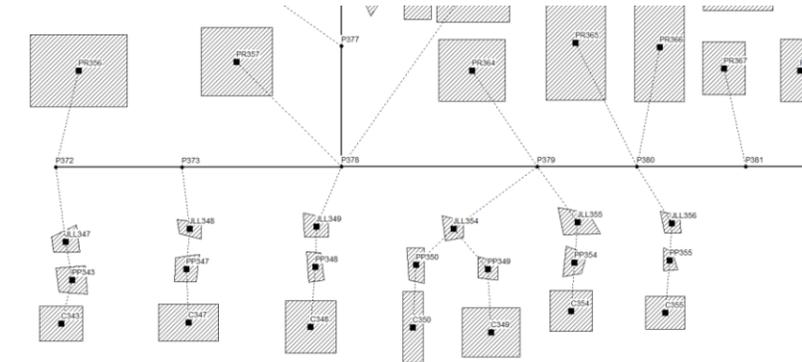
Detail of SUDS connection segments 3F, 2Z and 3G. Alternative 3
